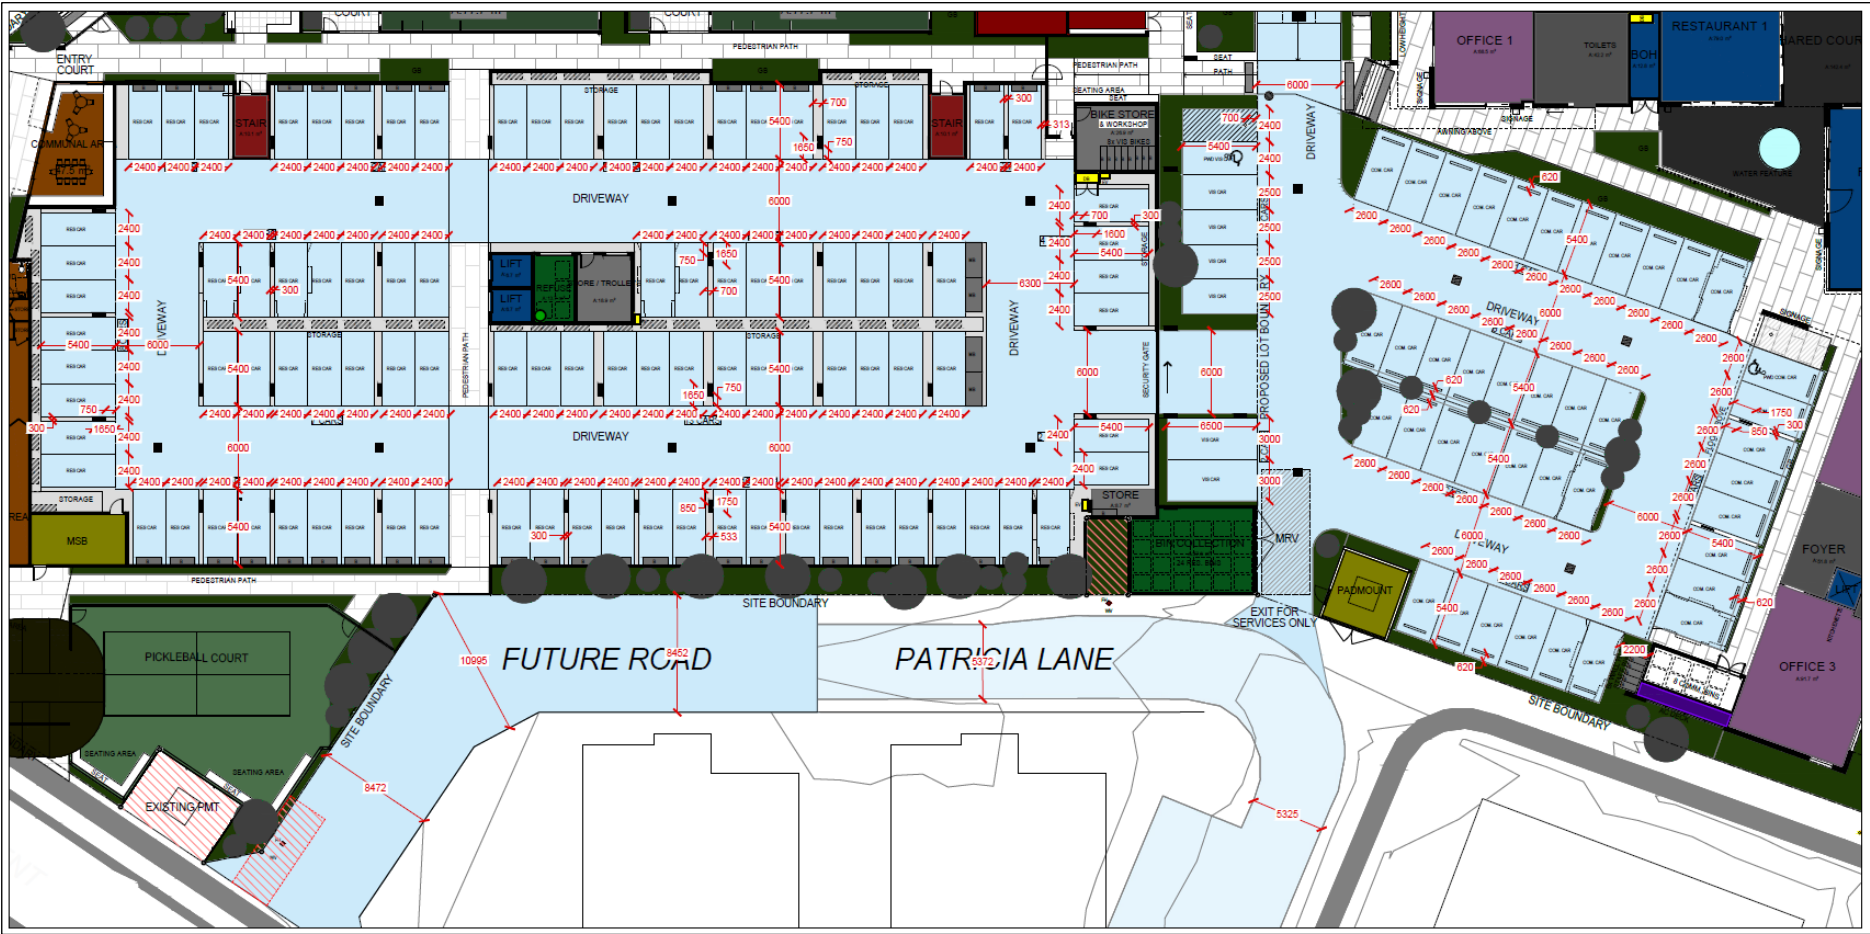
DIMENSIONED CAR PARKING PLAN
